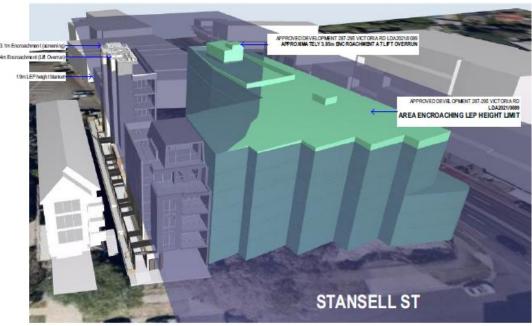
Building height plane diagram from front of site (the building in green shading is the adjoining approved building at 287-295 Victoria Road)
